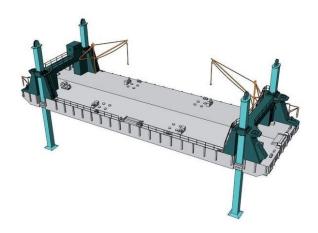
3D Model of Mulberry Harbour Spud Installation (avrmodel.com)
